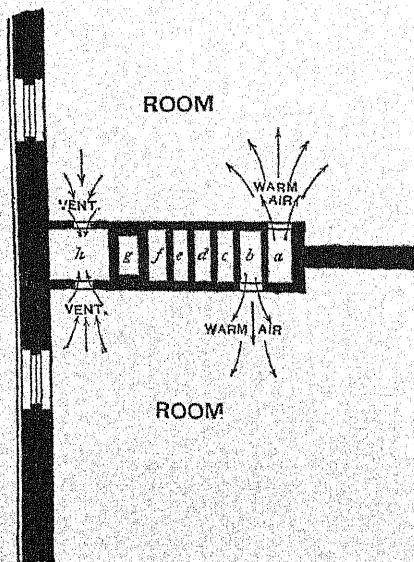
Plan showing Stack of Inlets and Outlets, "Smead" System.
